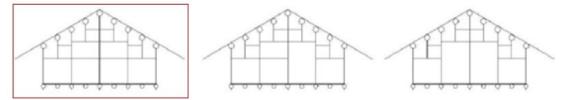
Schematic diagram of penetrating tie for roof frame (drawn by the author)
